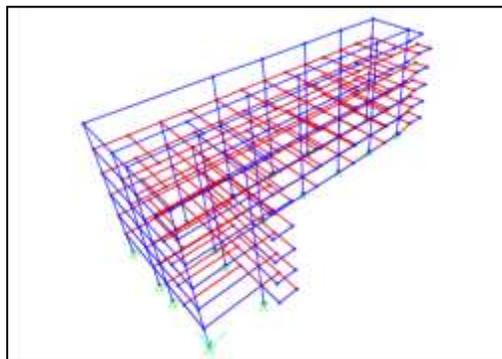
Structural model of BCE II building of Sta. Lucia high school
